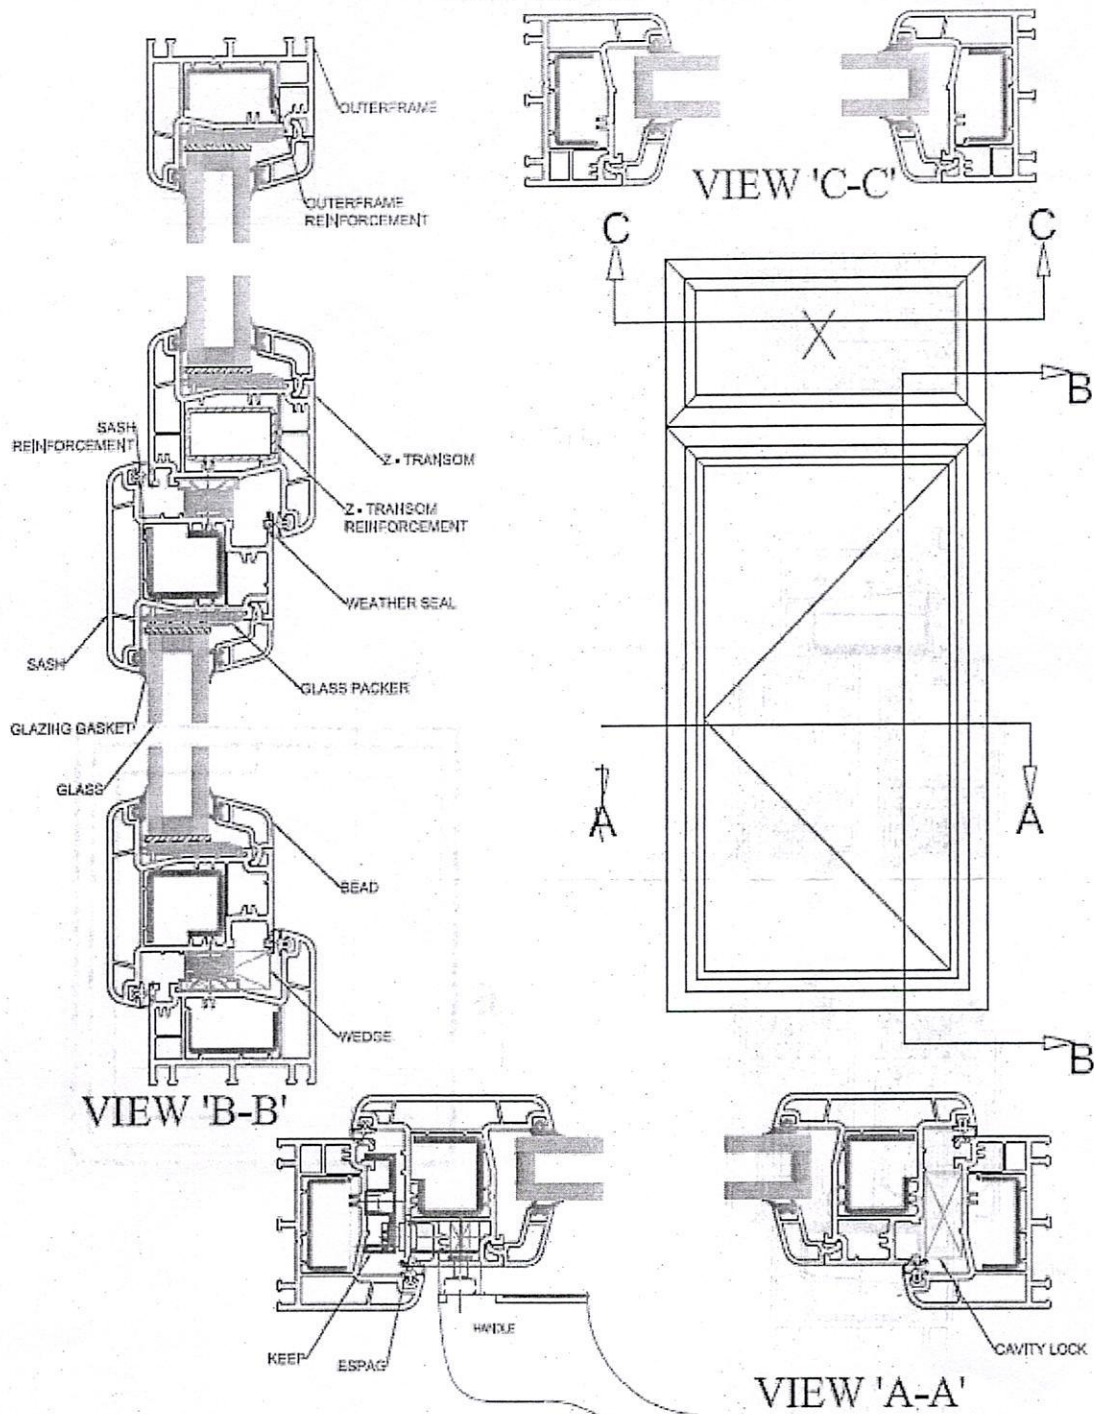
uPVC Doors and Windows (Typical casement with top fixed system)
